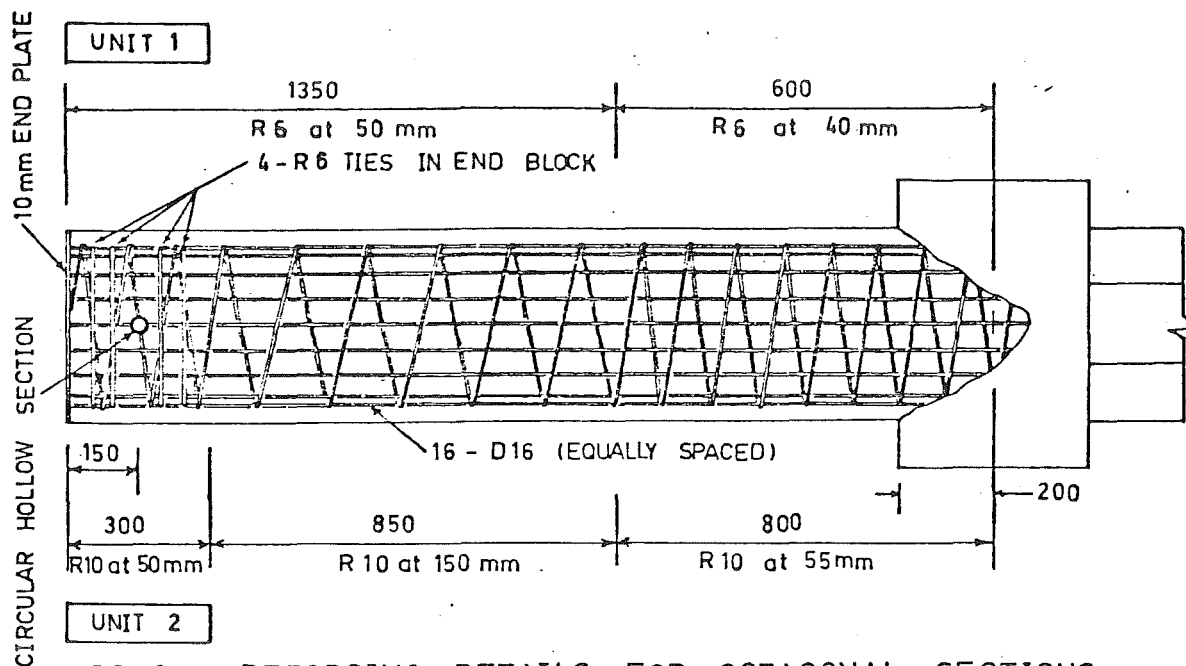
REINFORCING DETAILS FOR OCTAGONAL SECTIONS
